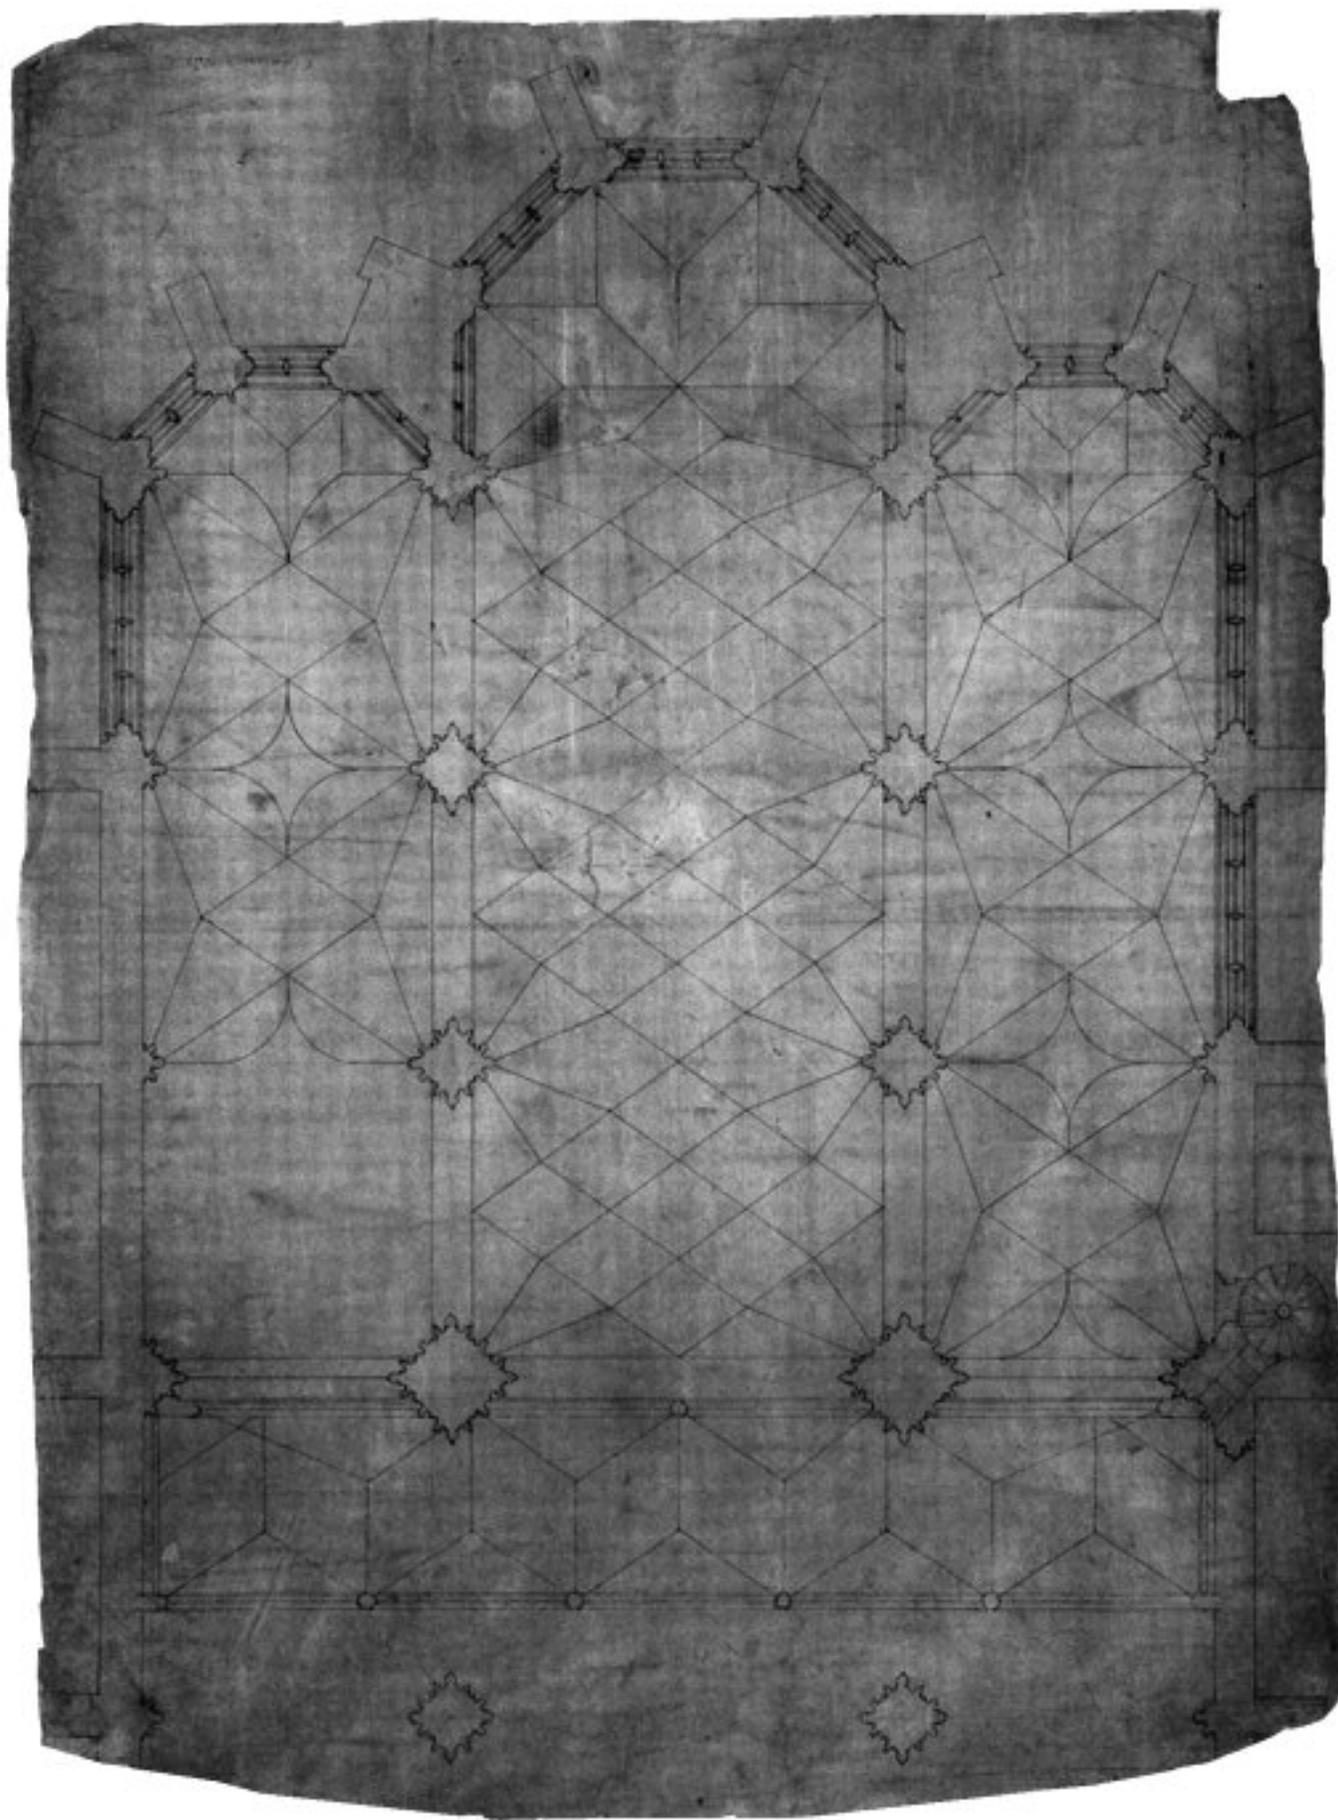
Drawing 16.890v, showing the plan of the parish church of Steyr. Parchment, 75.7 x 55.5 cm.
